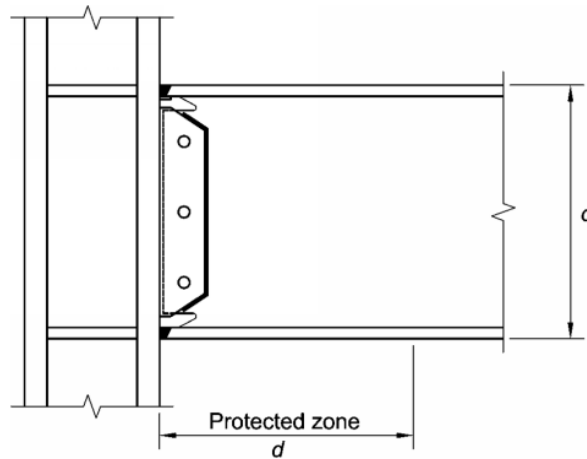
Welded Unreinforced Flange-Welded Web Moment Connection
